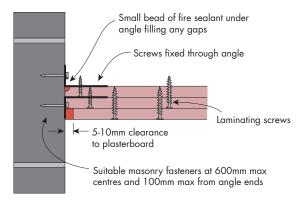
Laminated Duct to Masonry Wall Plan view
